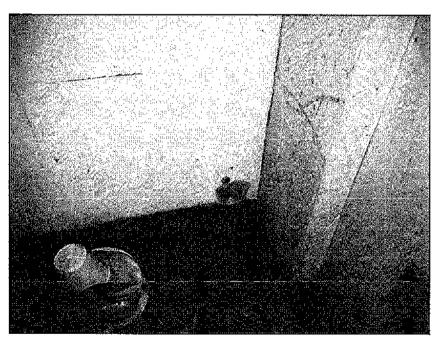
View of some of the mould inside unit 504A of the commercial building at 504 Clarke Road (October 28, 2011)
